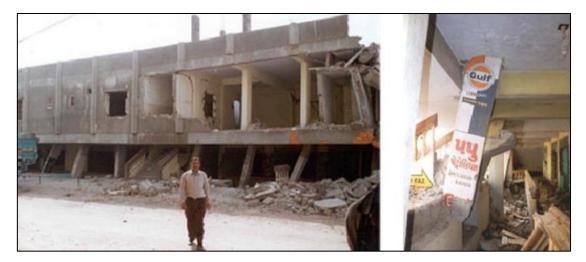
The collapsed ground floor of the children's hospital and research center in Gandhidham is a typical example of soft ground floor failure, as shown in the inset close-up view.
